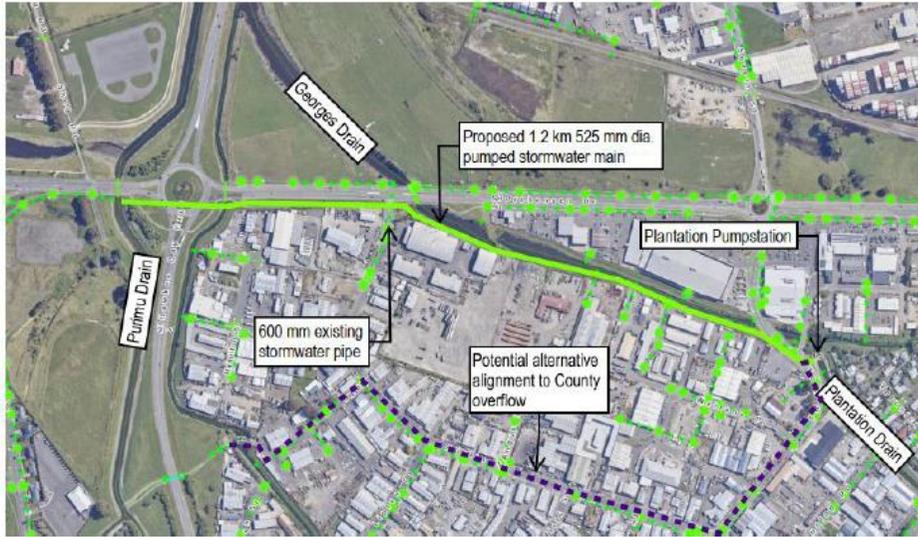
Potential Plantation alignment to direct treatment flow to Lagoon Farm
